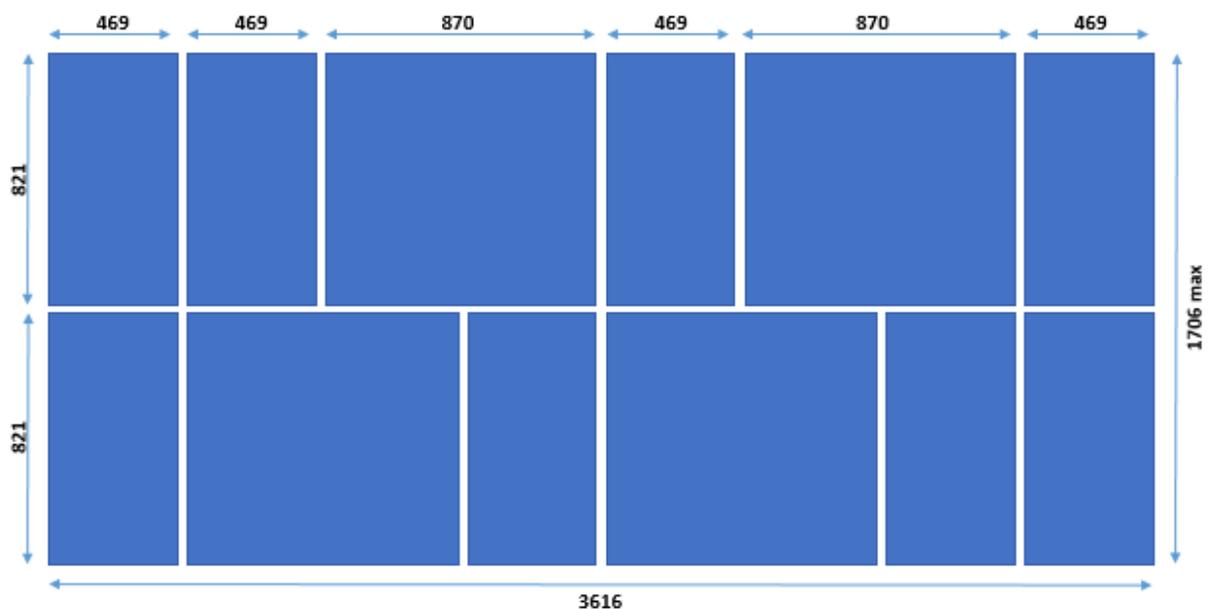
Layout from manufacturer SCHWEIZER - CSTB
